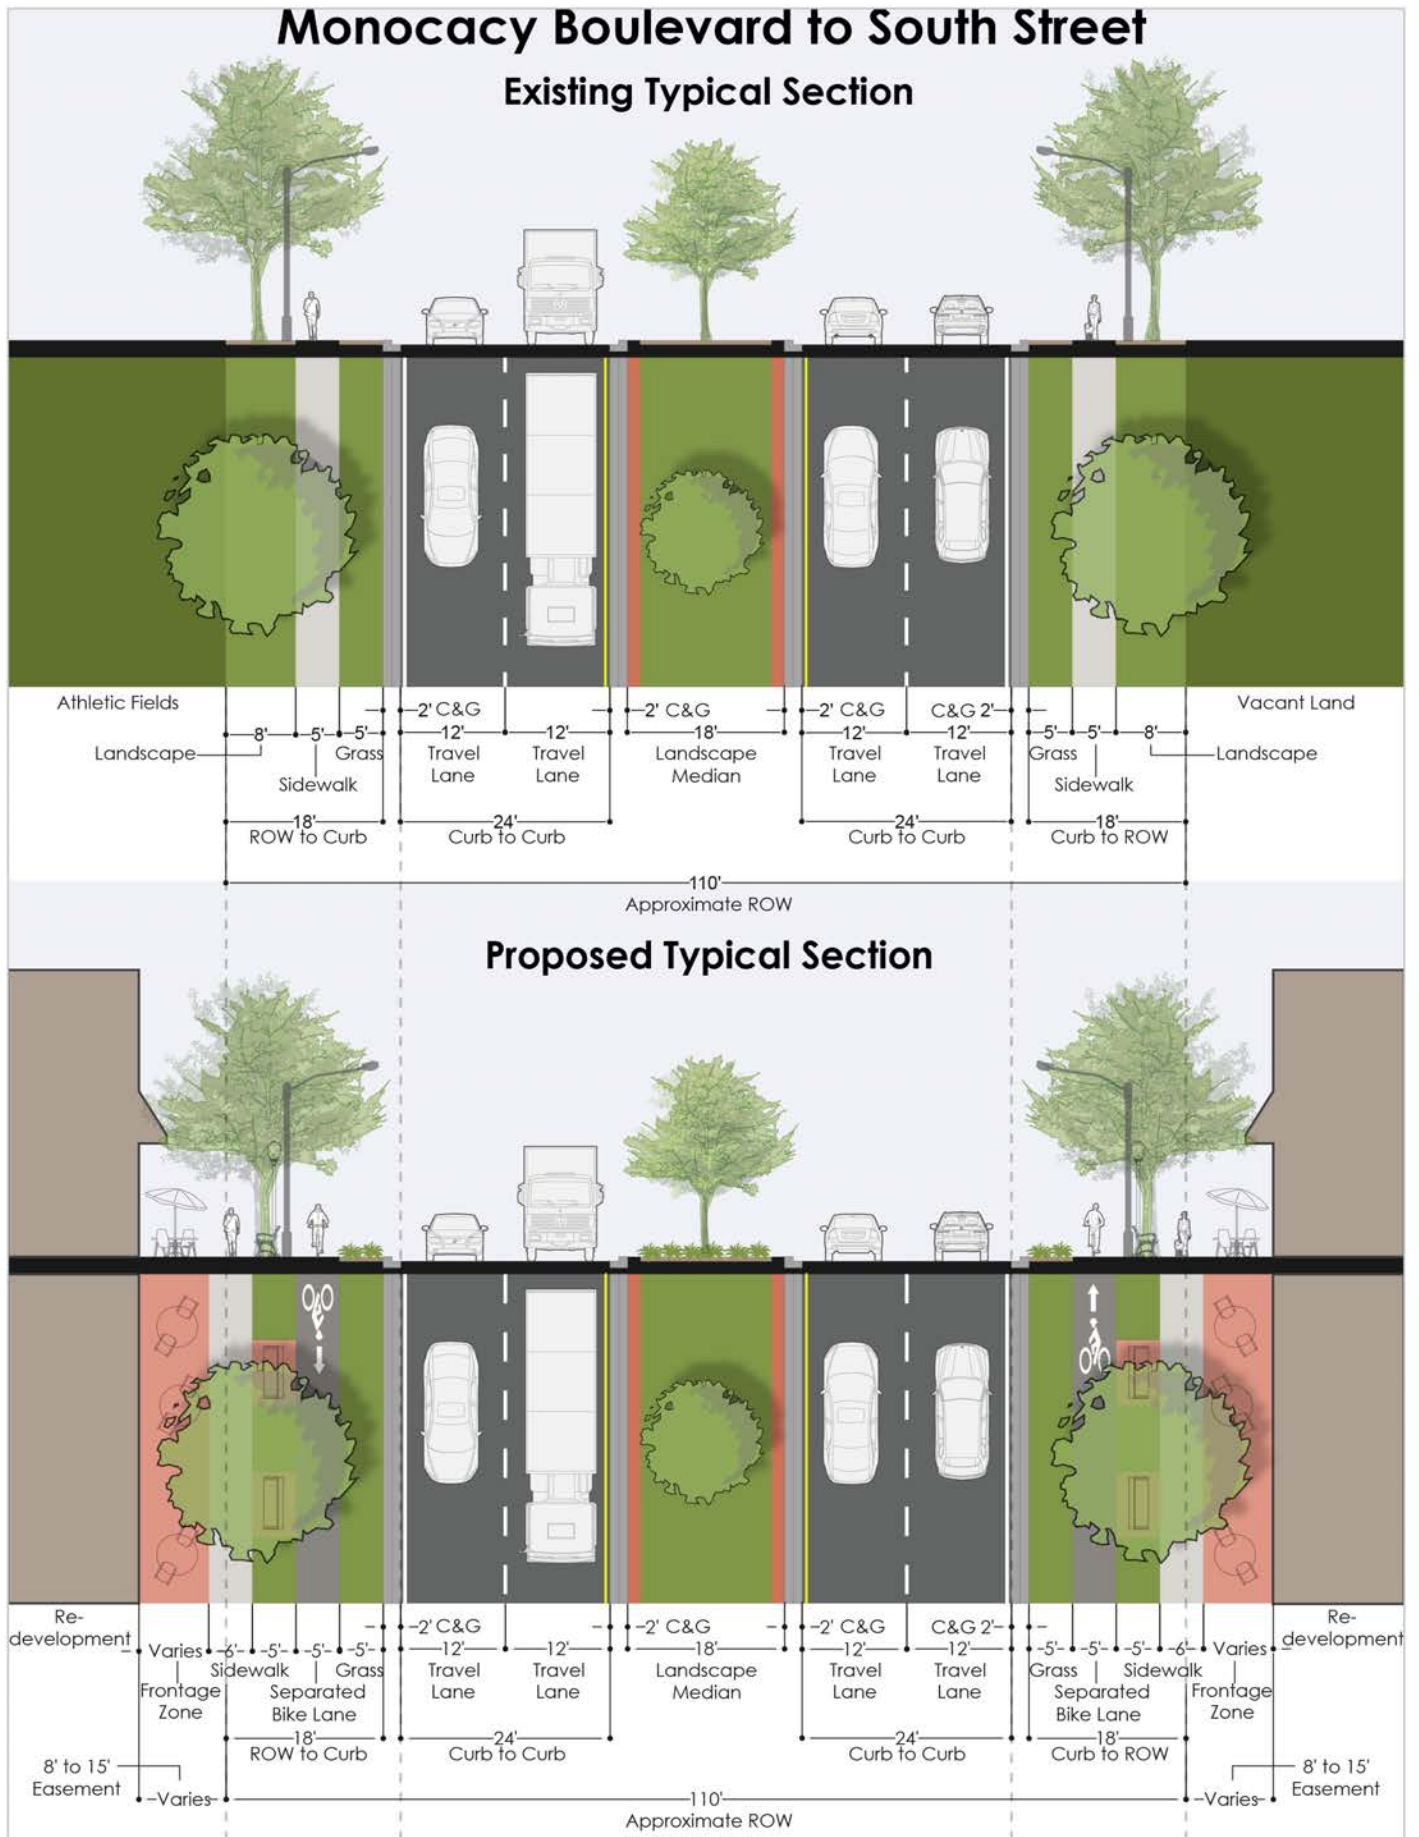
Existing and Proposed Typical Section - Monocacy Boulevard to South Street
